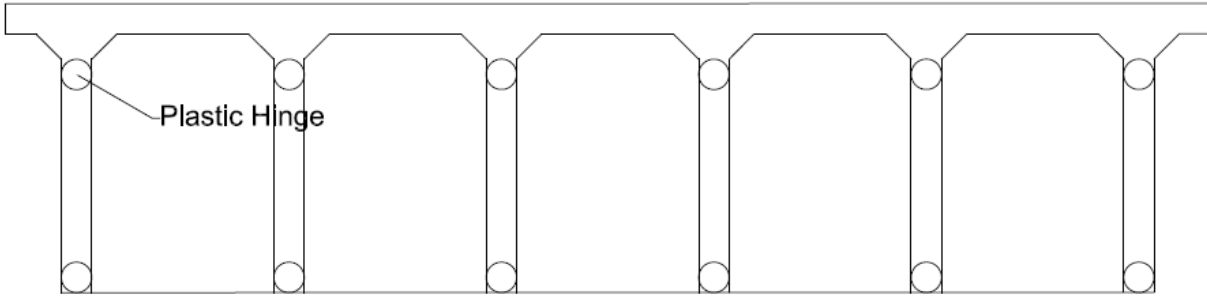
First Collapse Mechanism: Plastic Hinges Formed at Base and Top of Columns
